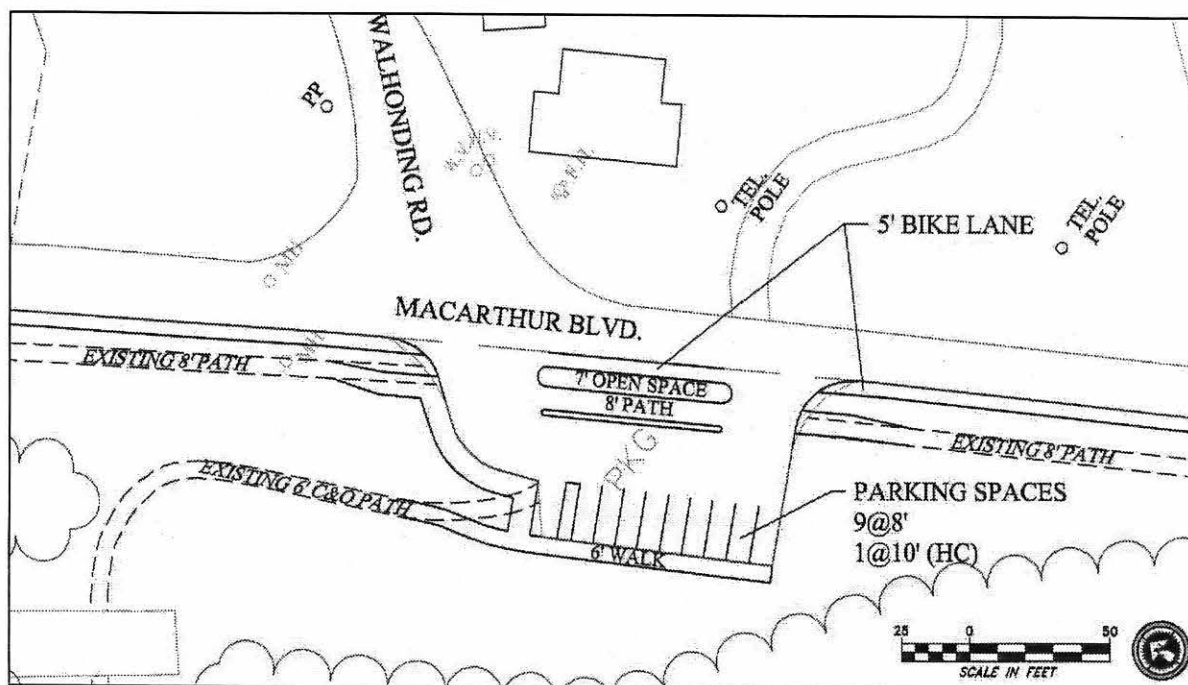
Conceptual Parking Lot Design at Walhonding Road
